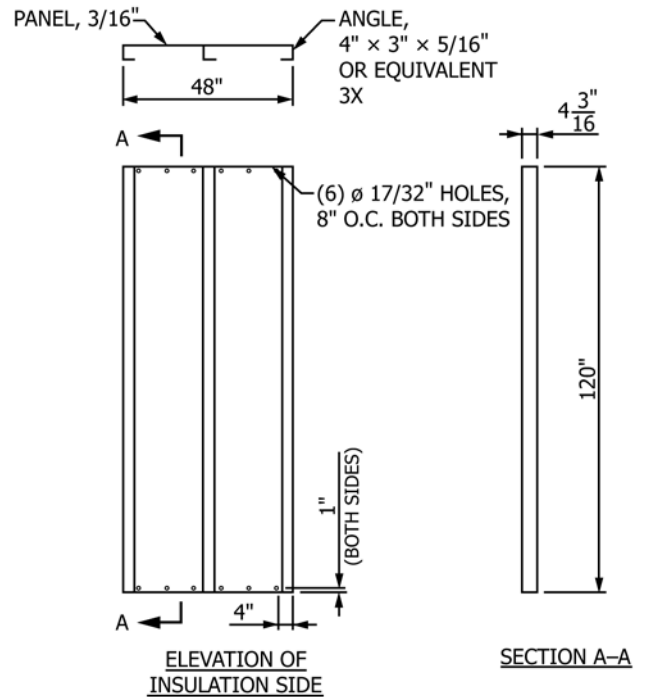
Steel Test Specimen Construction Details for A-Class Deck
